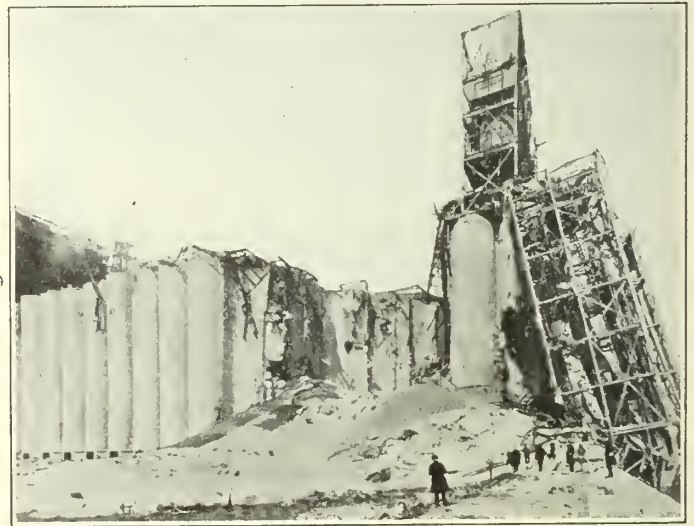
Chicago and Northwestern Railway Elevator wrecked by explosion.
